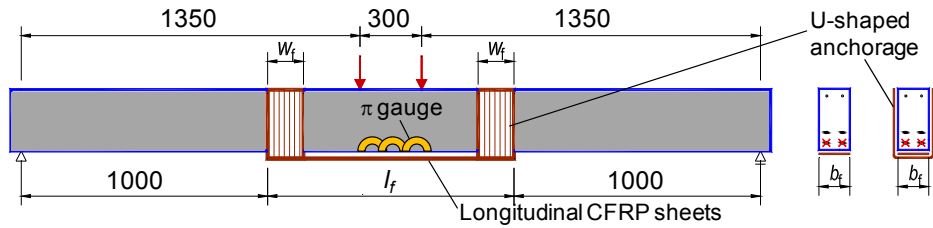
Layout of externally bonded CFRP sheets (Unit: mm)
